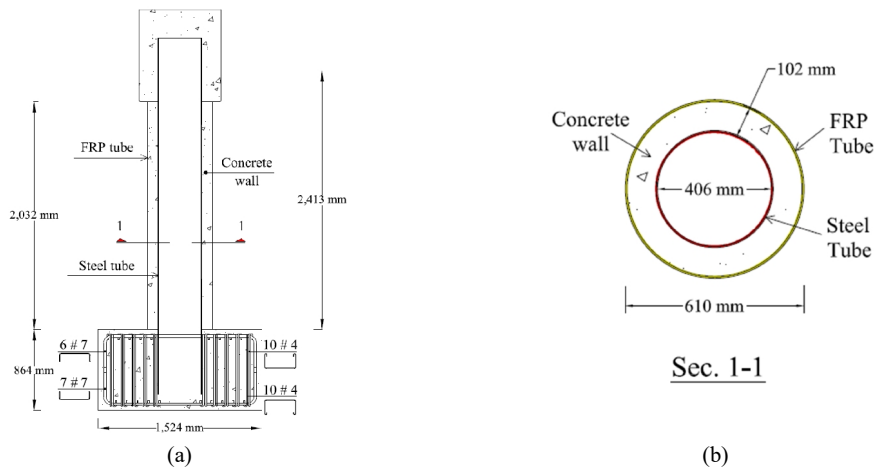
Construction layout of the column (a) Elevation, (b) column cross-section
